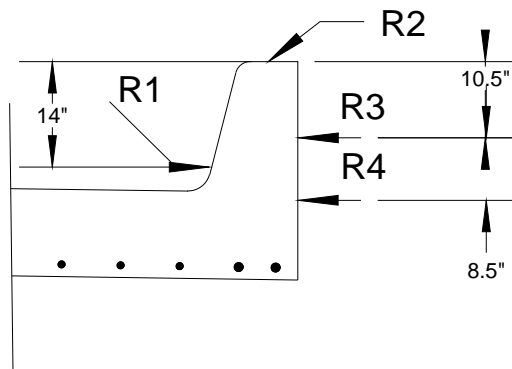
Detailed Locations of the Concrete Gages on the Rail.
